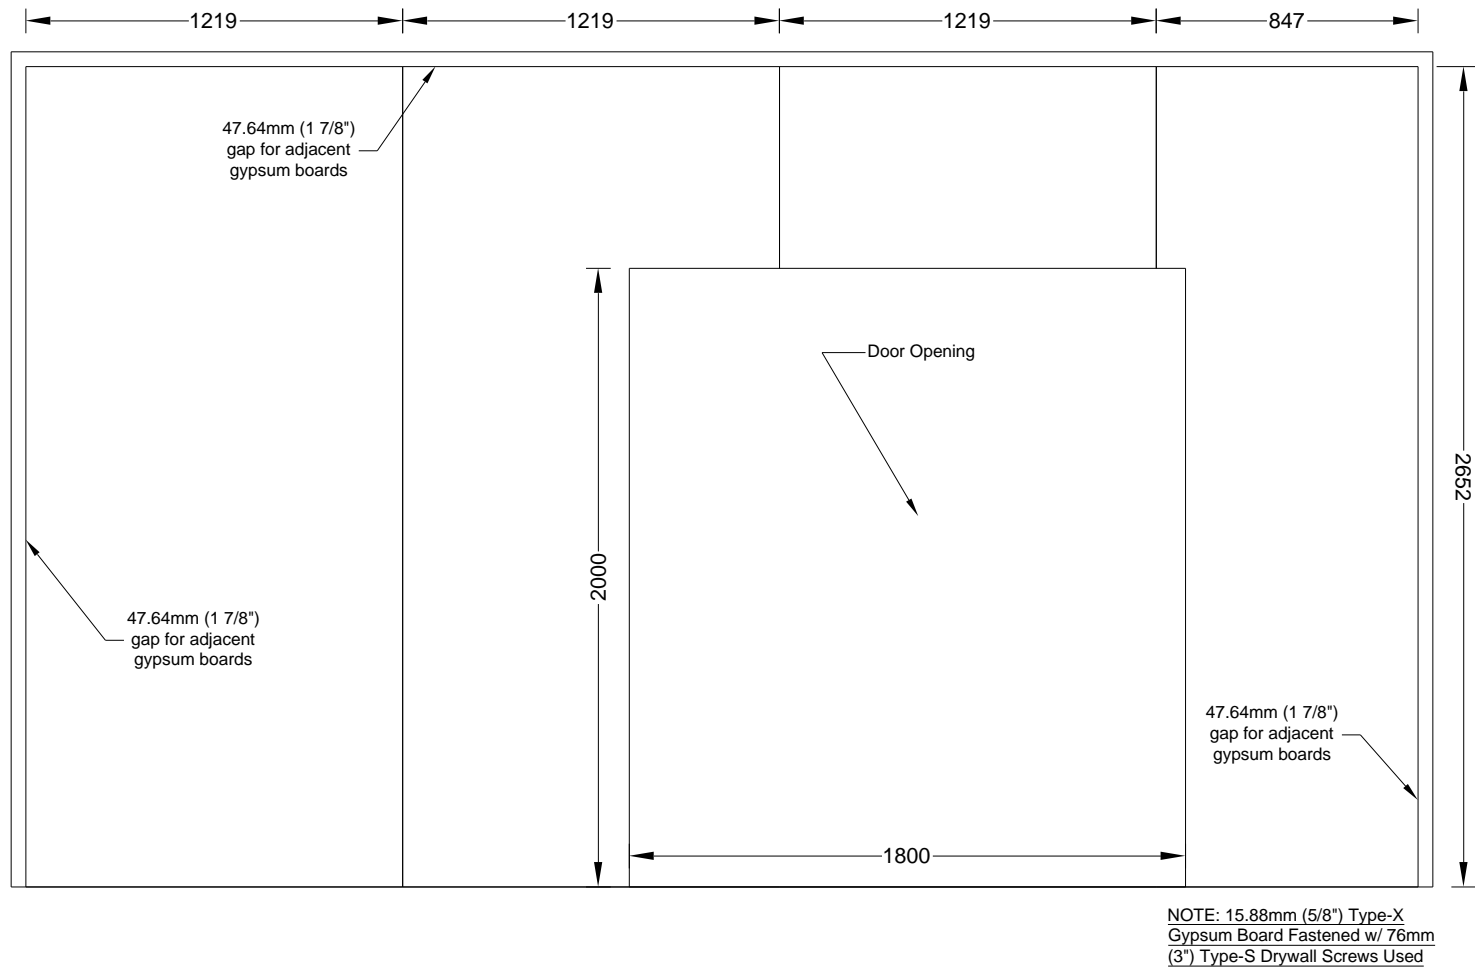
Test 1-2 Large Compartment CLT - W1 - Gypsum Layout - Face Layer
